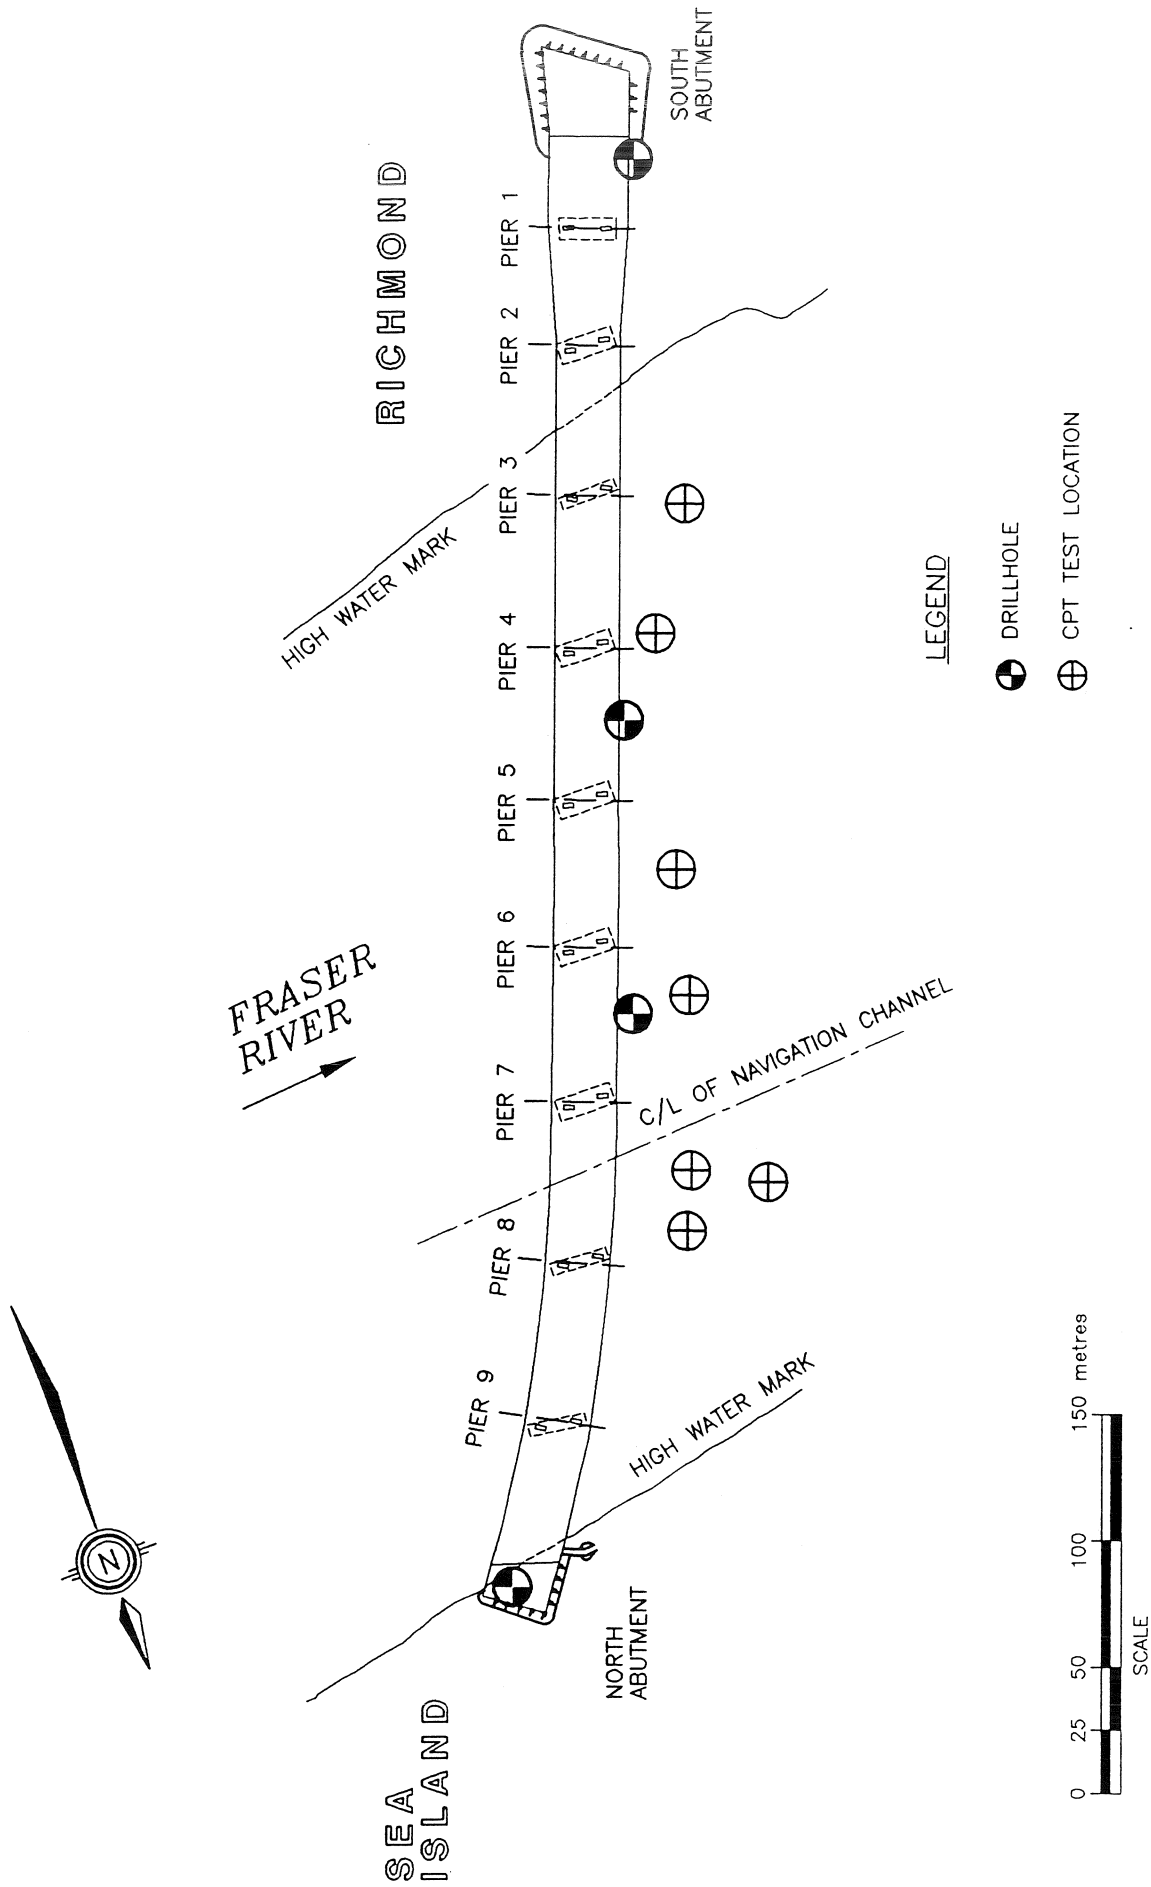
No. 2 Road Bridge - Site plan showing testhole locations
